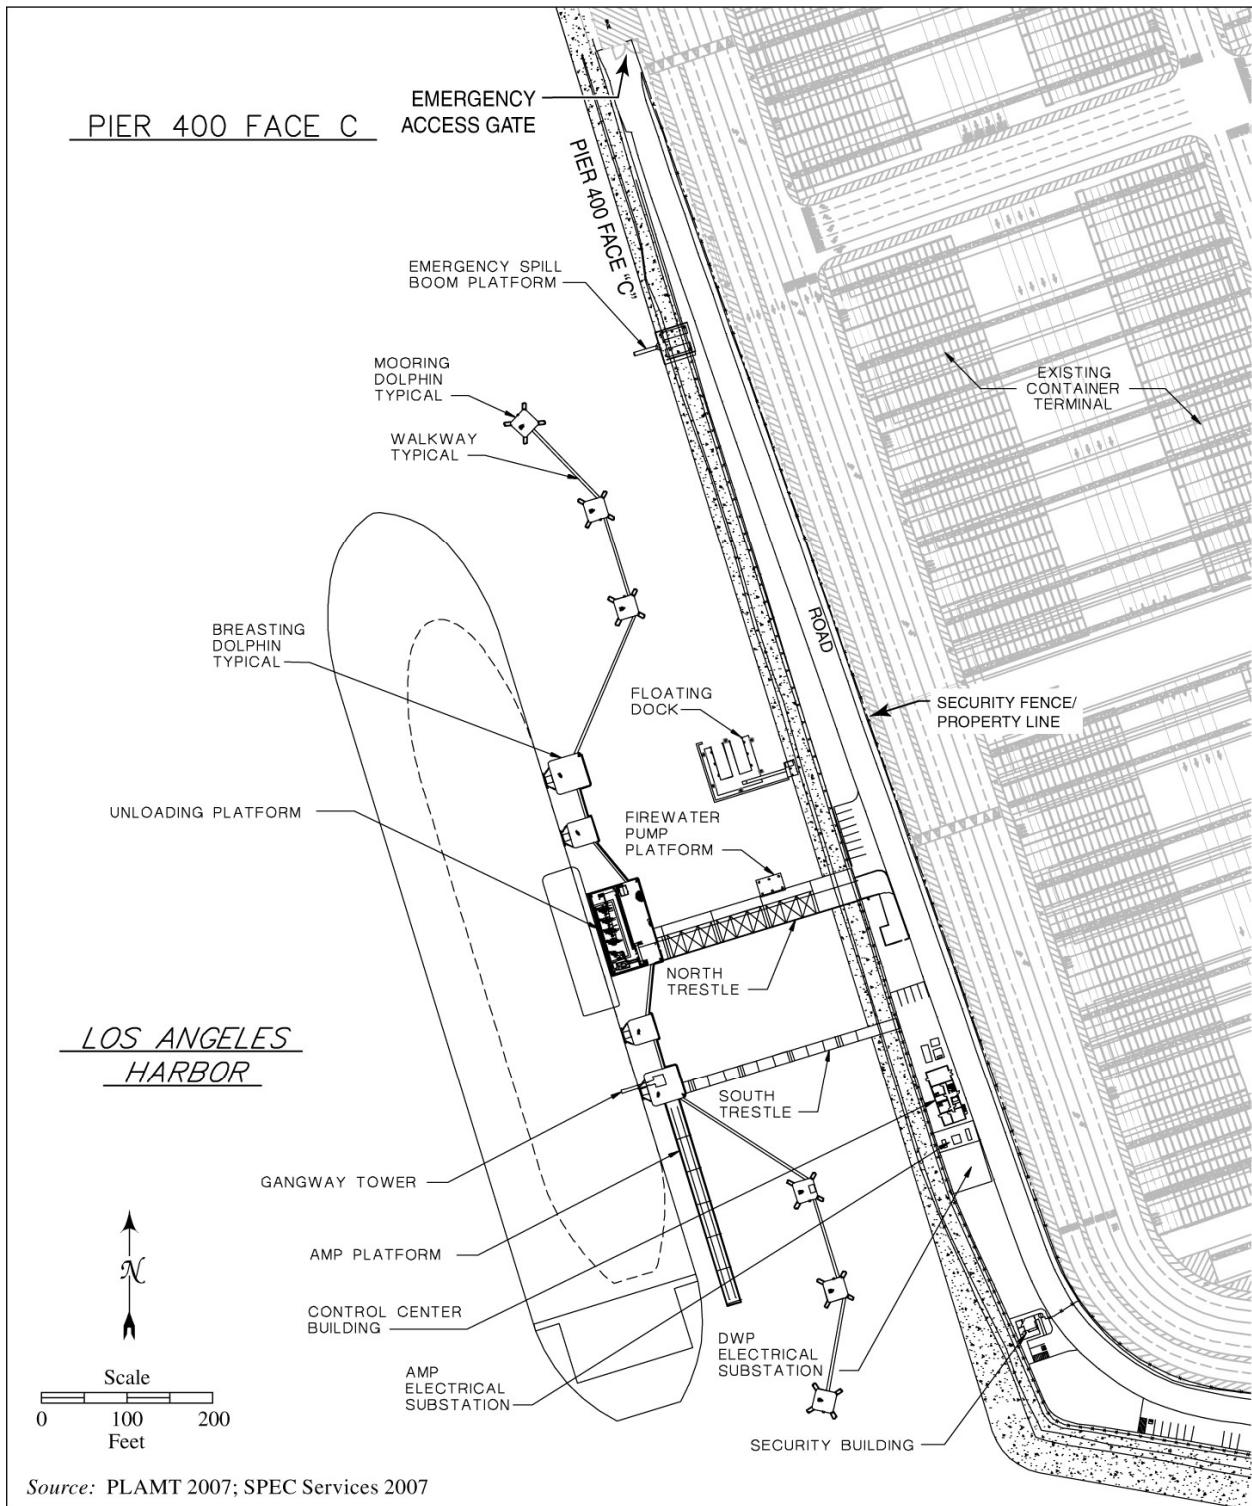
Face C of the Proposed Crude Oil Marine Terminal on Pier 400
